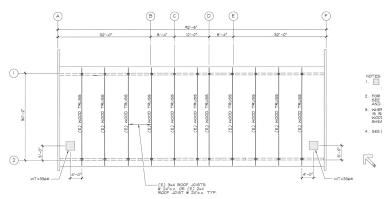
BUILDING 6: 2017 HVAC Upgrade Roof Framing Plan
